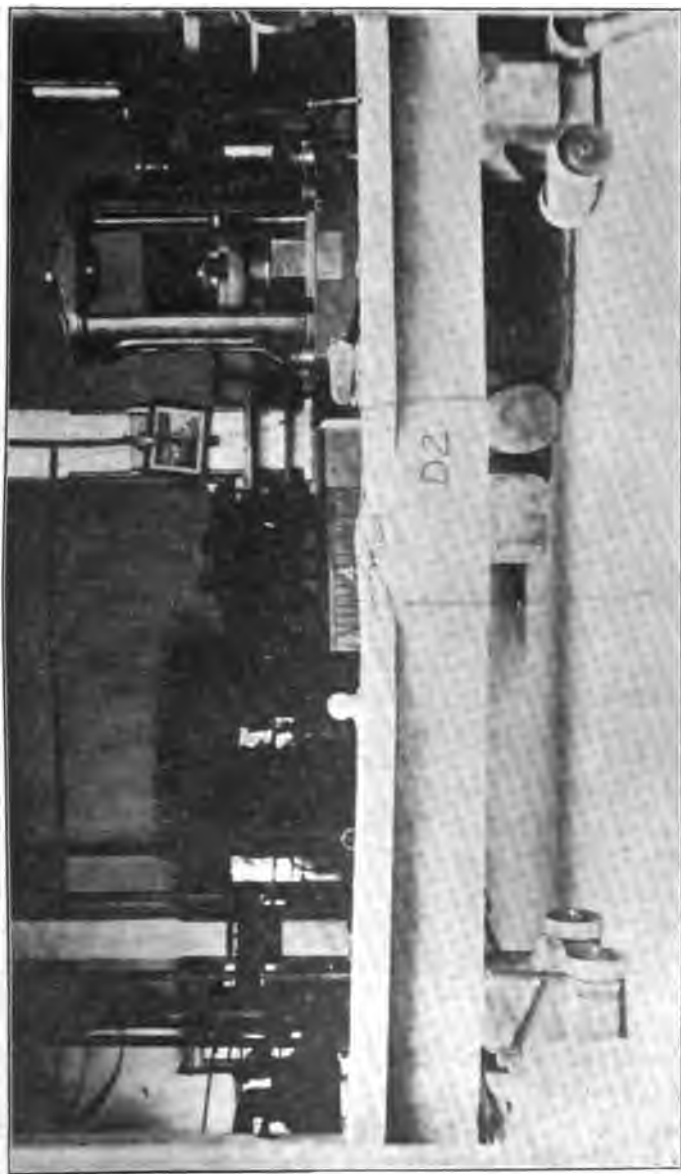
PLATE IV.—FAILURE CRACK IN TEE-BEAM D2.
